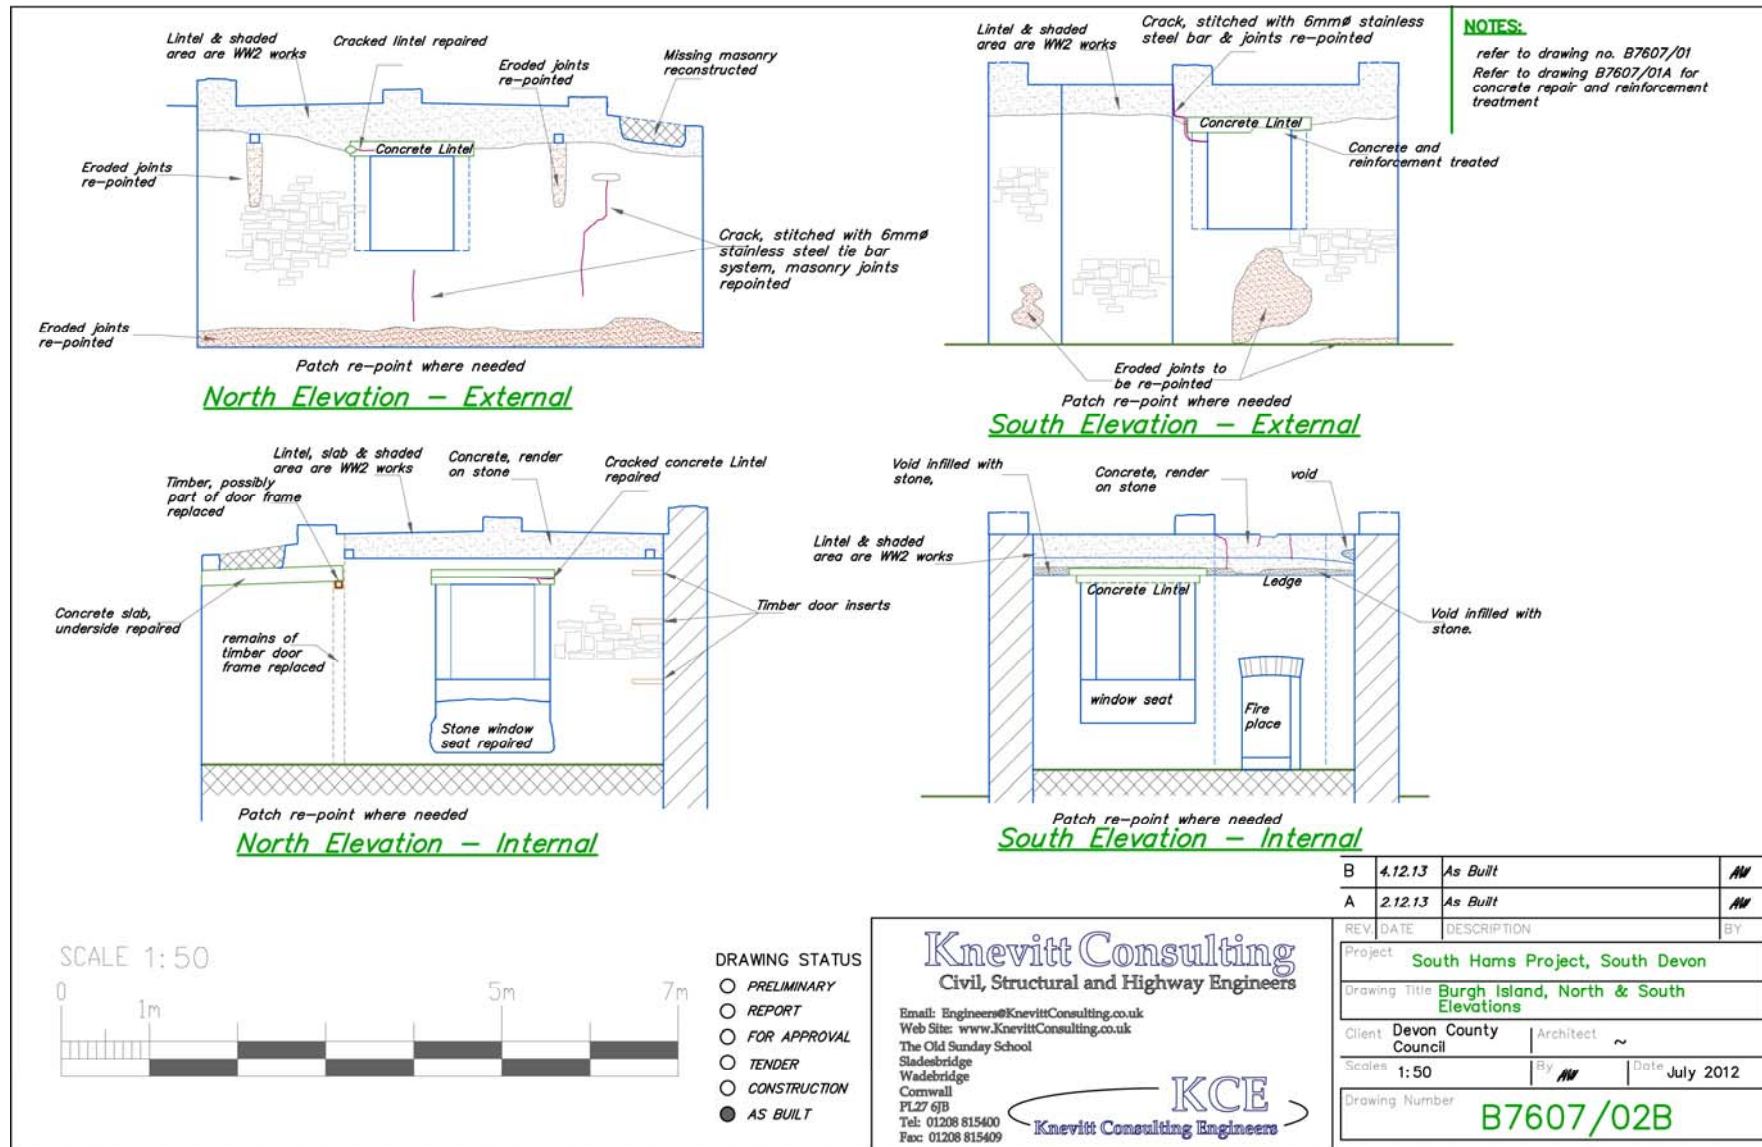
North and South elevational surveys (internal and external) of the Huer's observation building after works © Kneivitts 4/12/13.
